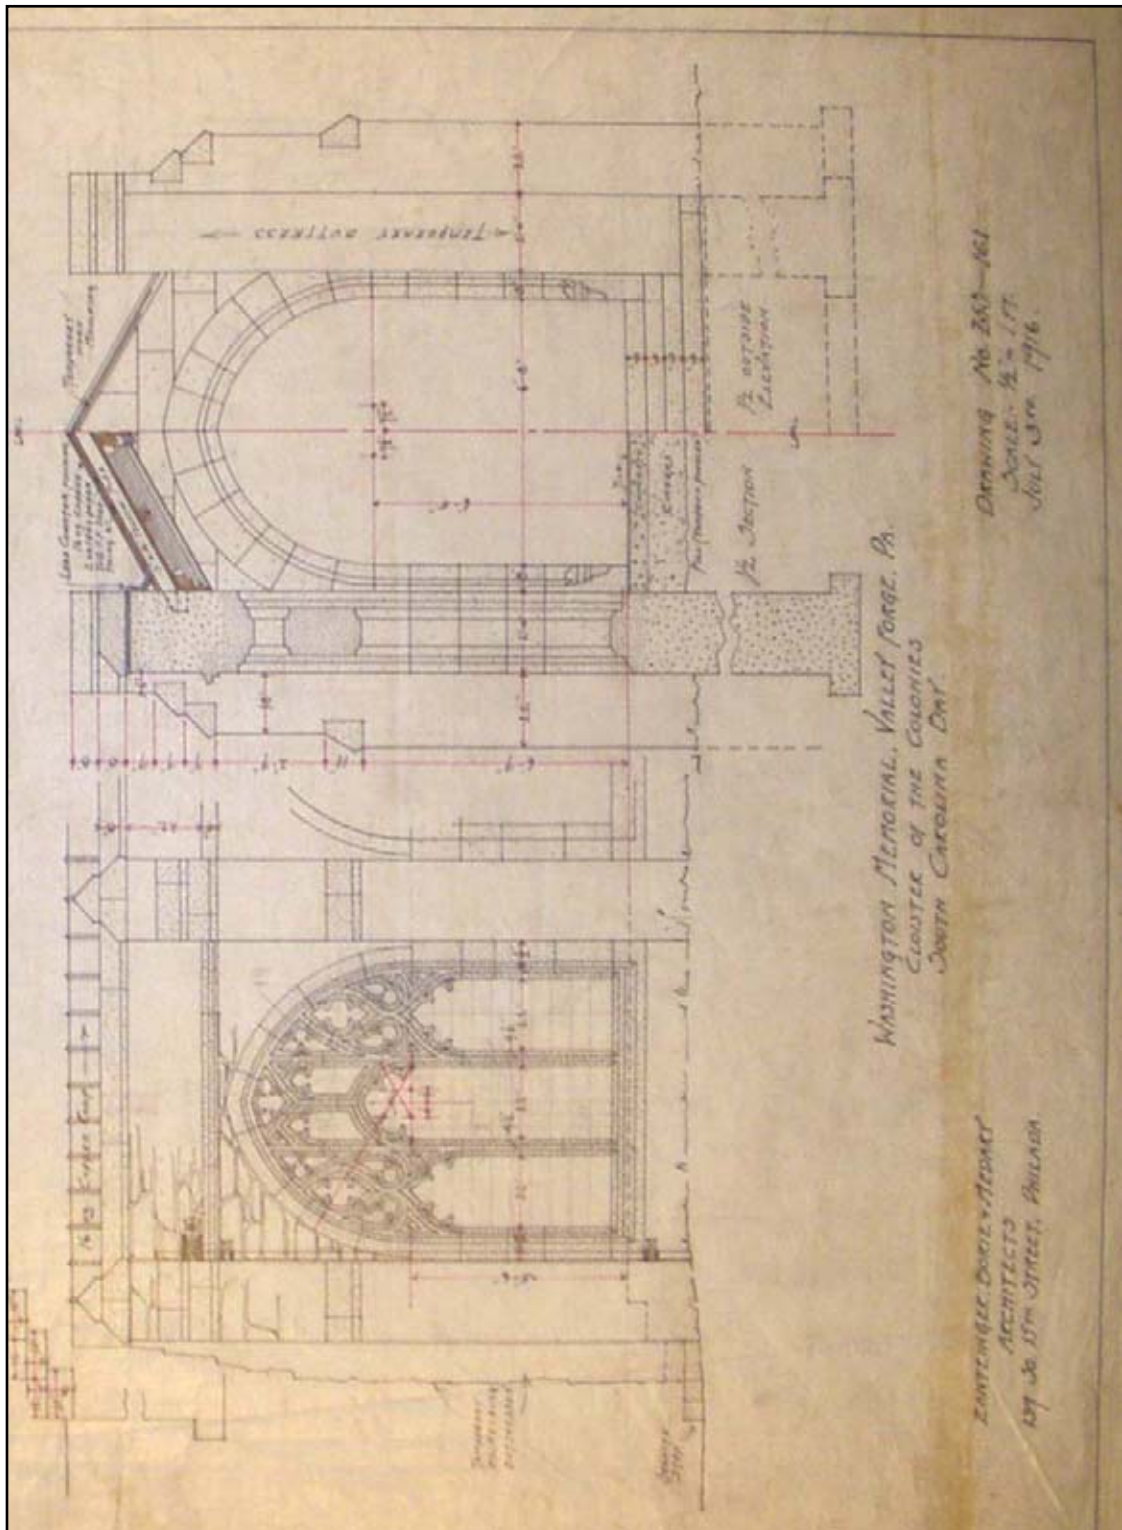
Drawings 160-161 from Zantzinger, Borie, and Medary Architects detailing the Cloister construction.
